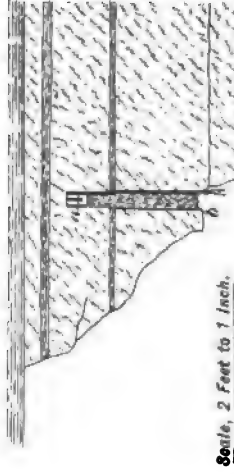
ELEVATION OF CARTRIDGE AND DETONATOR.
